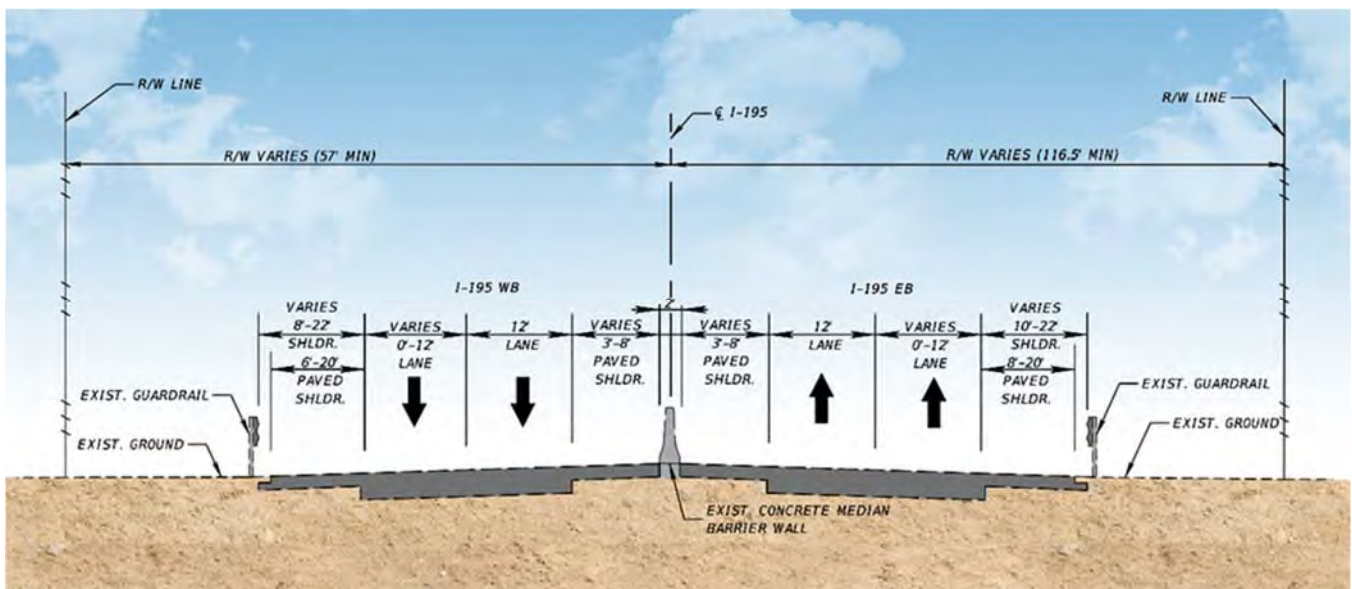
Typical Section - I-195 from NW 14th Avenue to NW 10th Avenue
